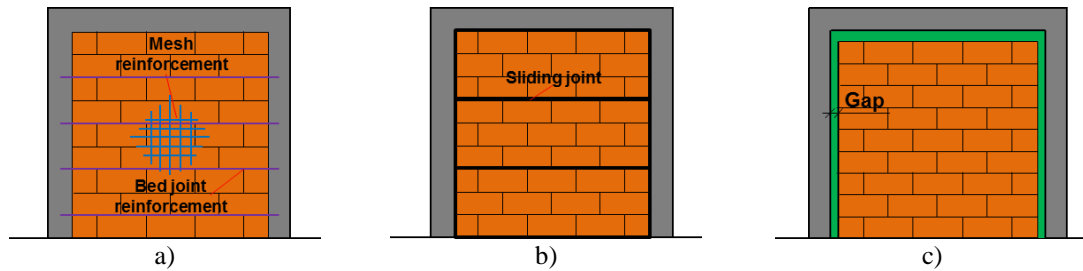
Approaches for improvement of behaviour of infilled frame under earthquake loading
